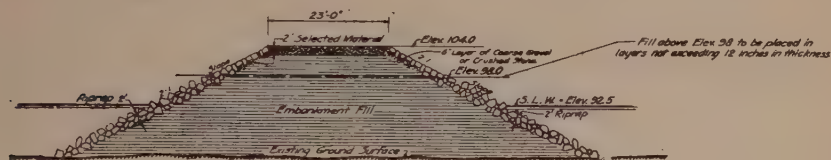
TYPICAL CROSS SECTION OF EMBANKMENT
